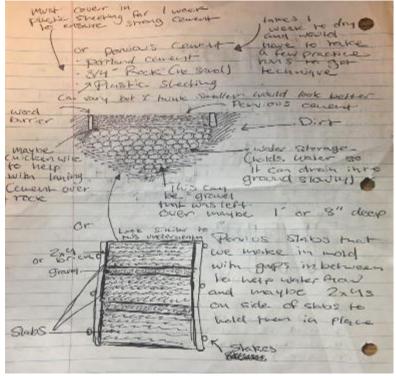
Example of a Permeable Concrete Path. Drawing by Jesse Bobrow.
